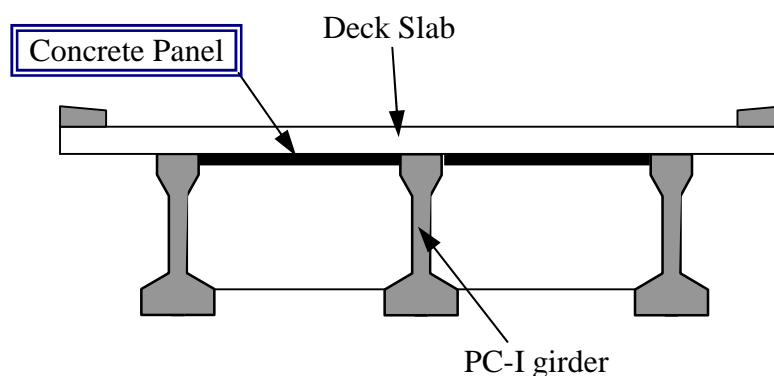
Concrete Panel as Non-structural Formwork
